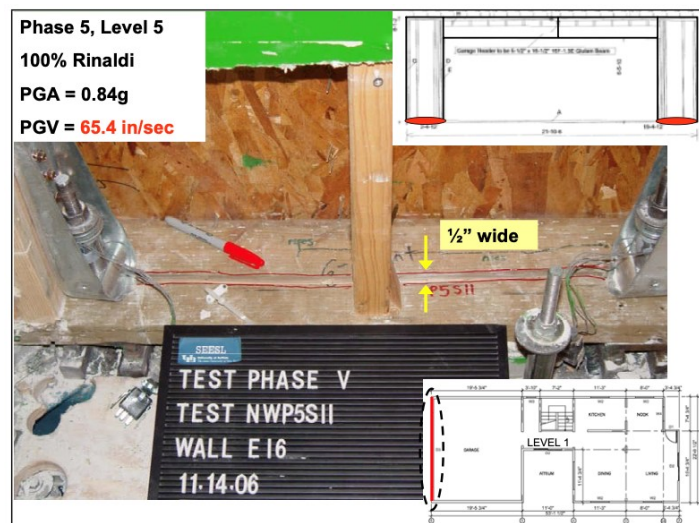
Cracking and separation of sill plate through entire length of garage narrow wall piers (Christovasilis et al., n.d., 2009)
